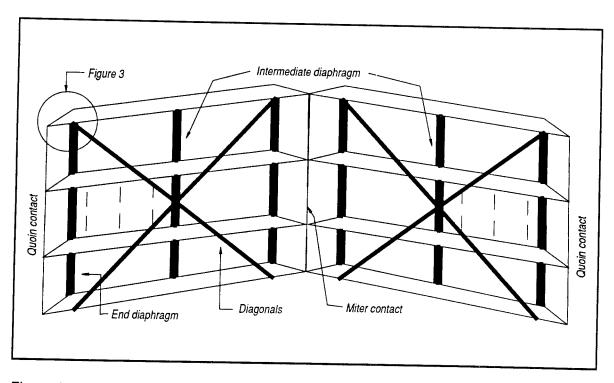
Downstream view of detailed structural elements of horizontally framed miter gate
